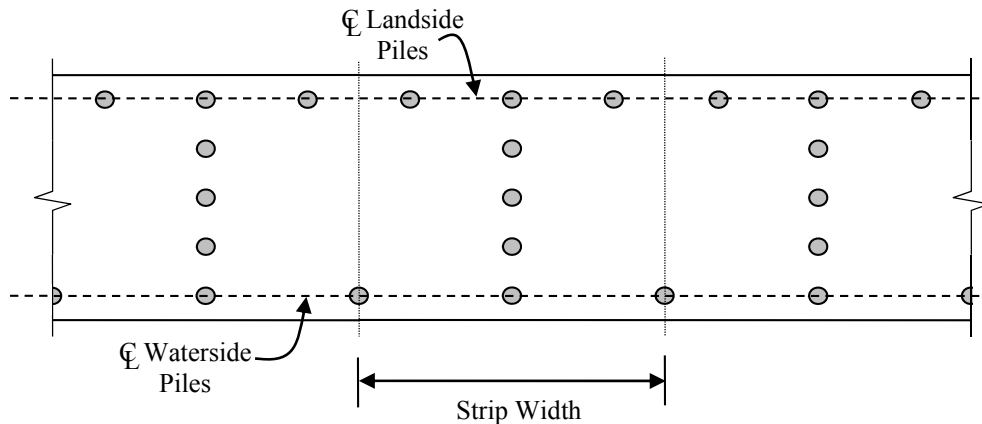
Pile Spacing for Modeling of Typical Wharf Strip
